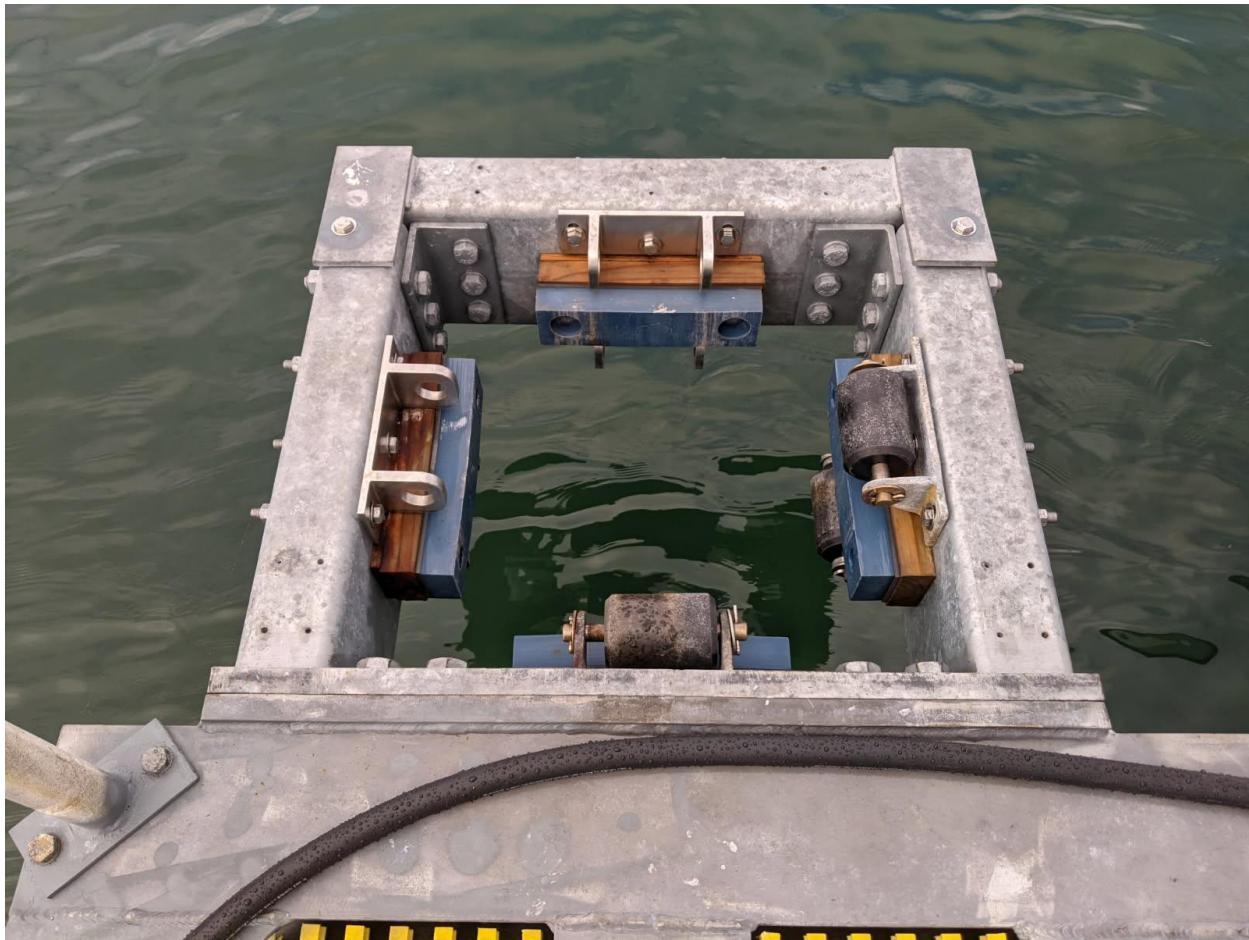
Upgraded pile guide assemblies (PGAs). These are constructed of heavier gauge steel, larger members, and heavier duty fasteners compared to the original PGAs. They also include bespoke mounting provisions for the custom load pins and elevation sensors (left and top). Shown partially assembled, the PGAs still require some mechanical components (shims, spacers, washers, brackets, etc.) before the load pins and elevation sensors can be installed.
